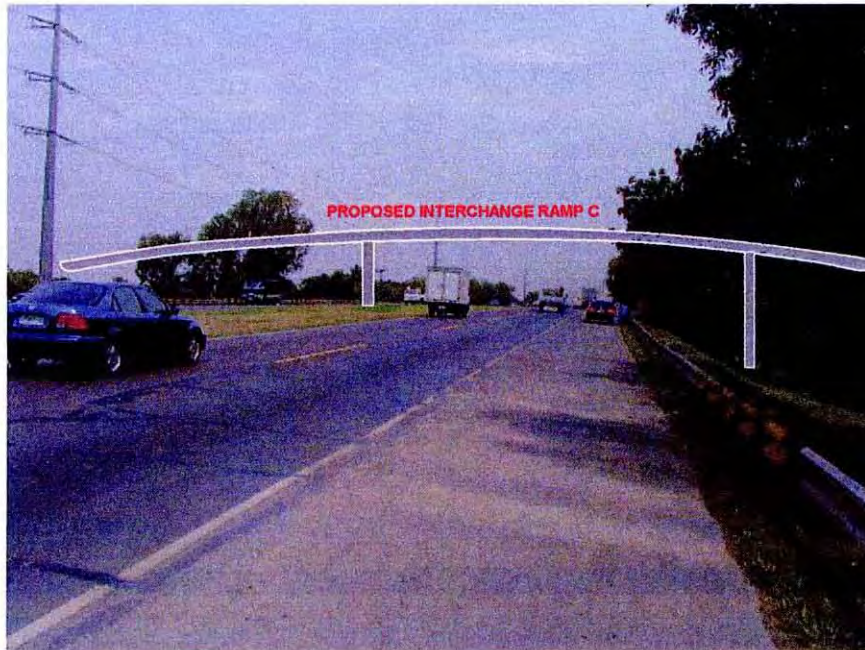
NORTH LUZON EXPRESSWAY
